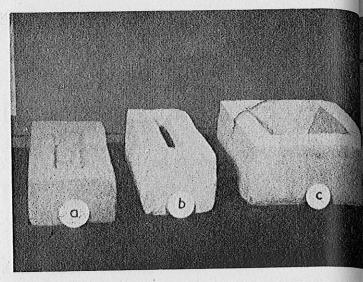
(a) Traditional Brick (b) Modular Brick (c) Modular Block
